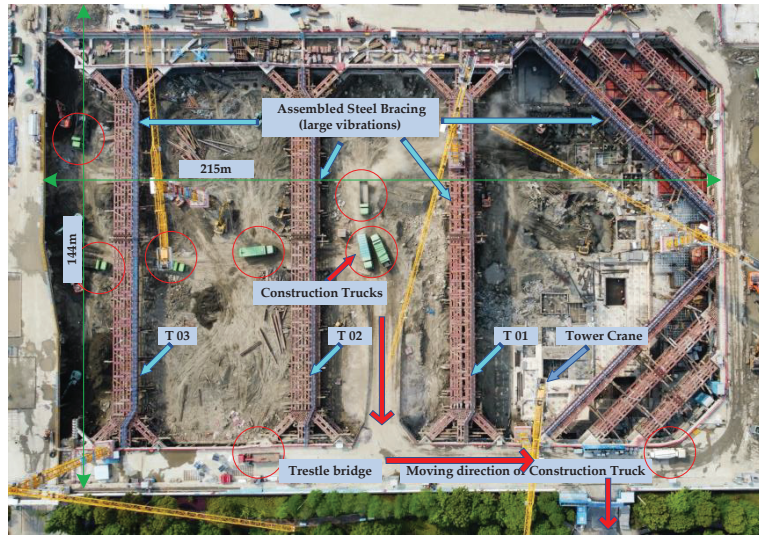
Steel assembly bracing of foundation pit and truck driving route.
